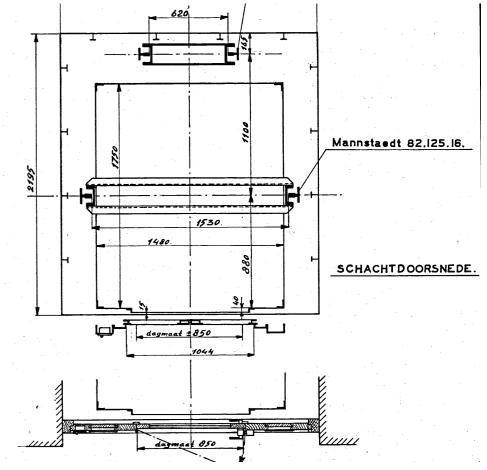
Elevator design drawings (Gemeentewerken Rotterdam, 1932)
